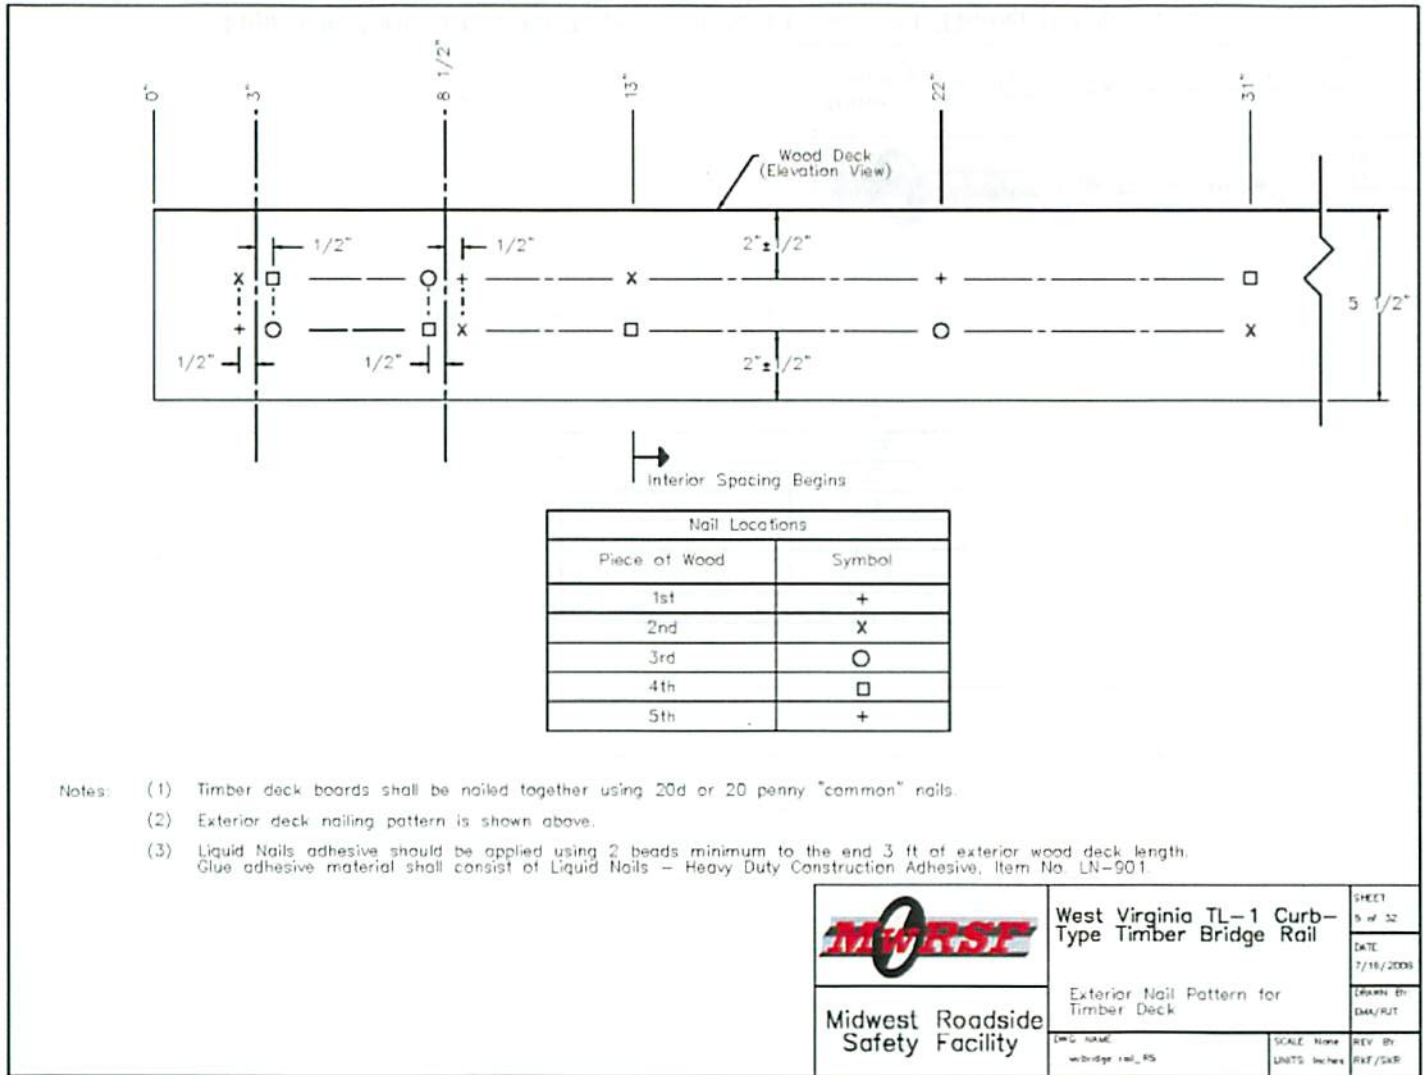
Exterior Nail Pattern for Transverse, Nail-Laminated, Timber Bridge Deck
